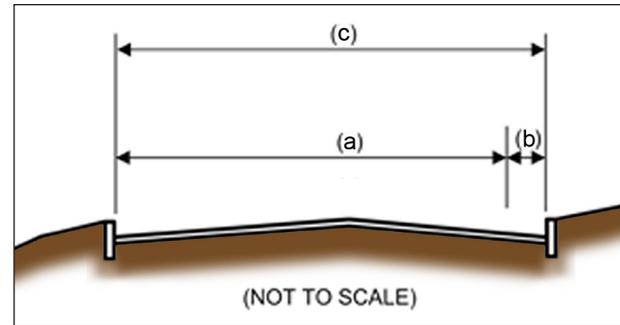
Cross-Section Profile -- Curbed Residential Mixed-Use Collector Street
